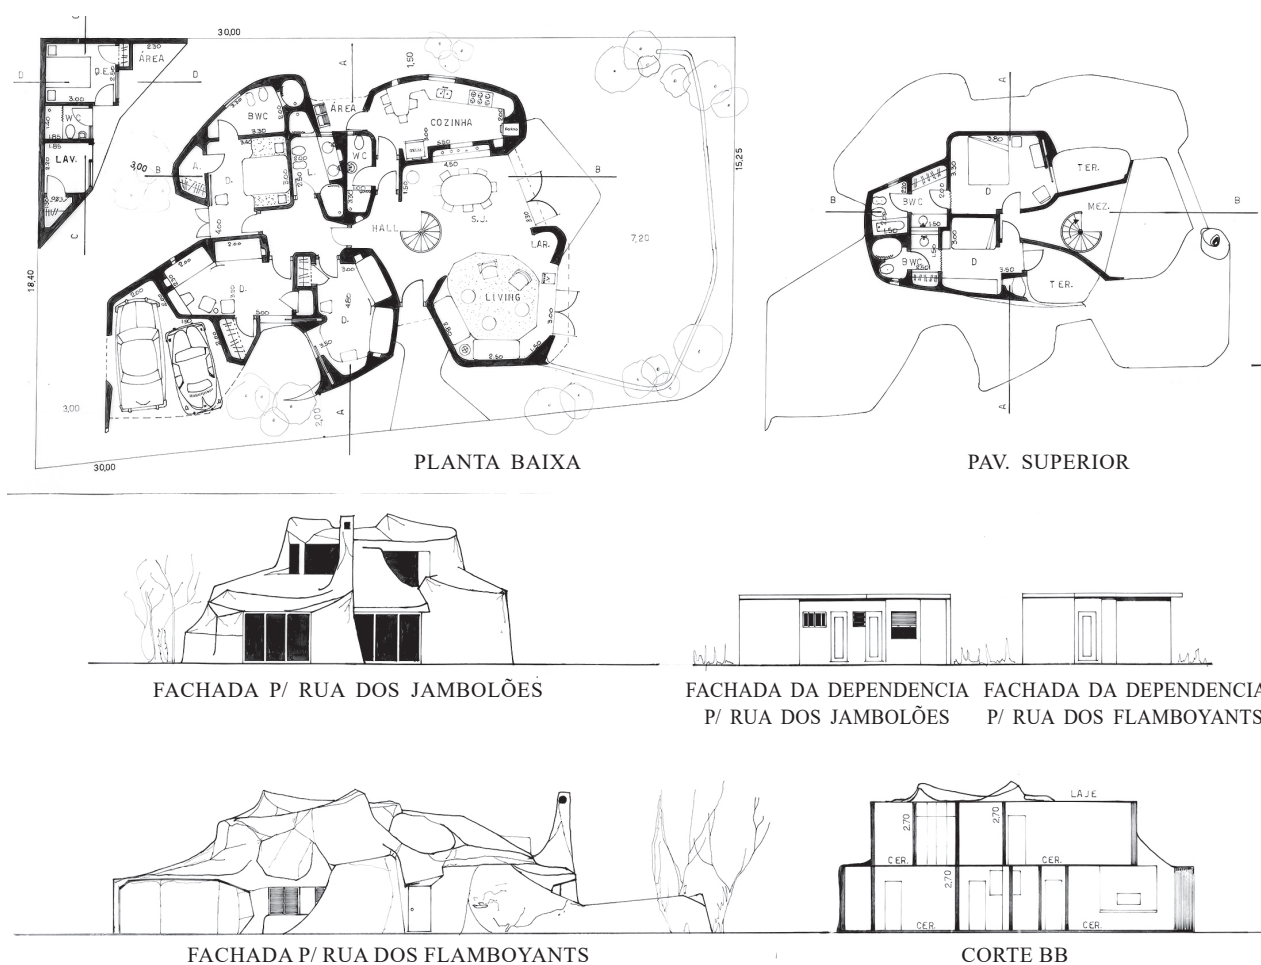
Floor plans, elevations, and a cross-section of Zalszupin's residence in Guarujá (source: © Jorge Zalszupin, Acervo Casa Zalszupin)
